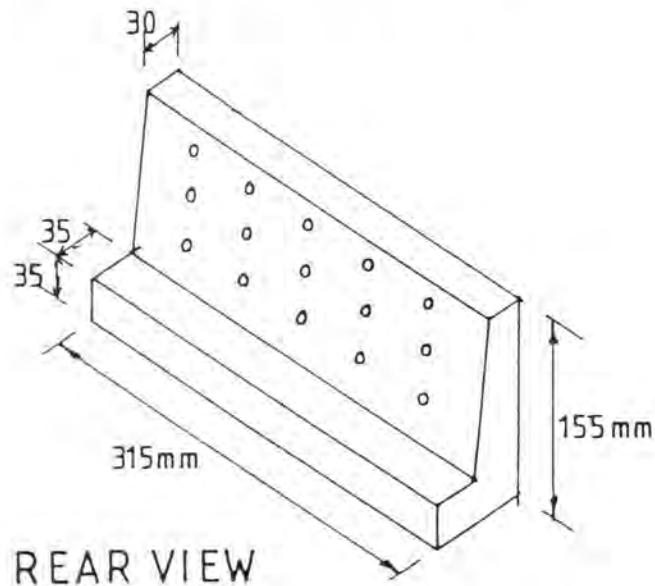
Rebated Brick Facing from Bexhill, Sussex
